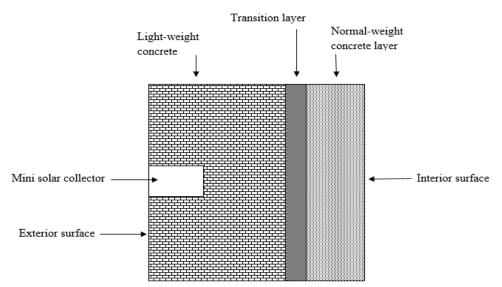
Horizontal section through wall panel previously displayed in Ref. [7]
